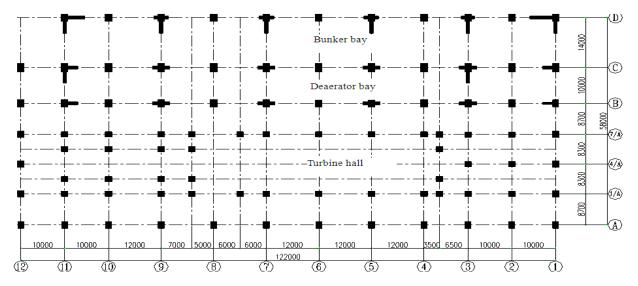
Plane arrangement chart of steel reinforced concrete frame-dispersed shear wall
